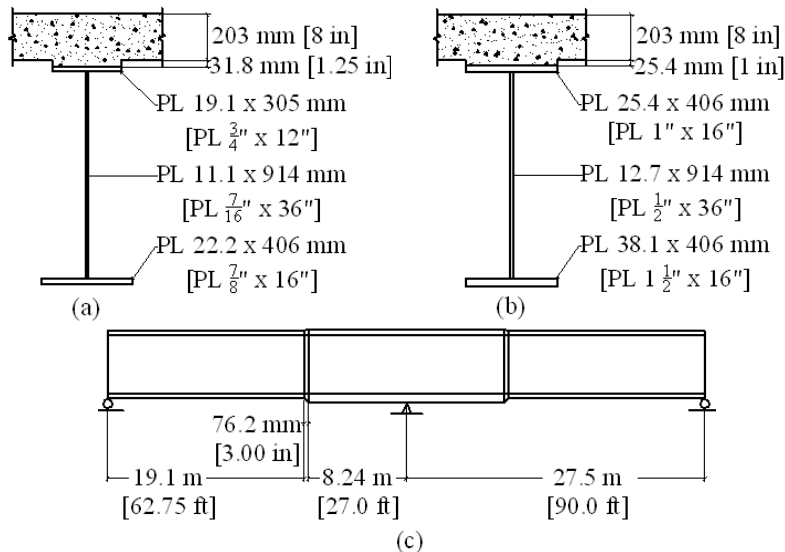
(a) Positive girder cross-section. (b) Negative girder cross-section. (c) Location of positive and negative cross-sections.
